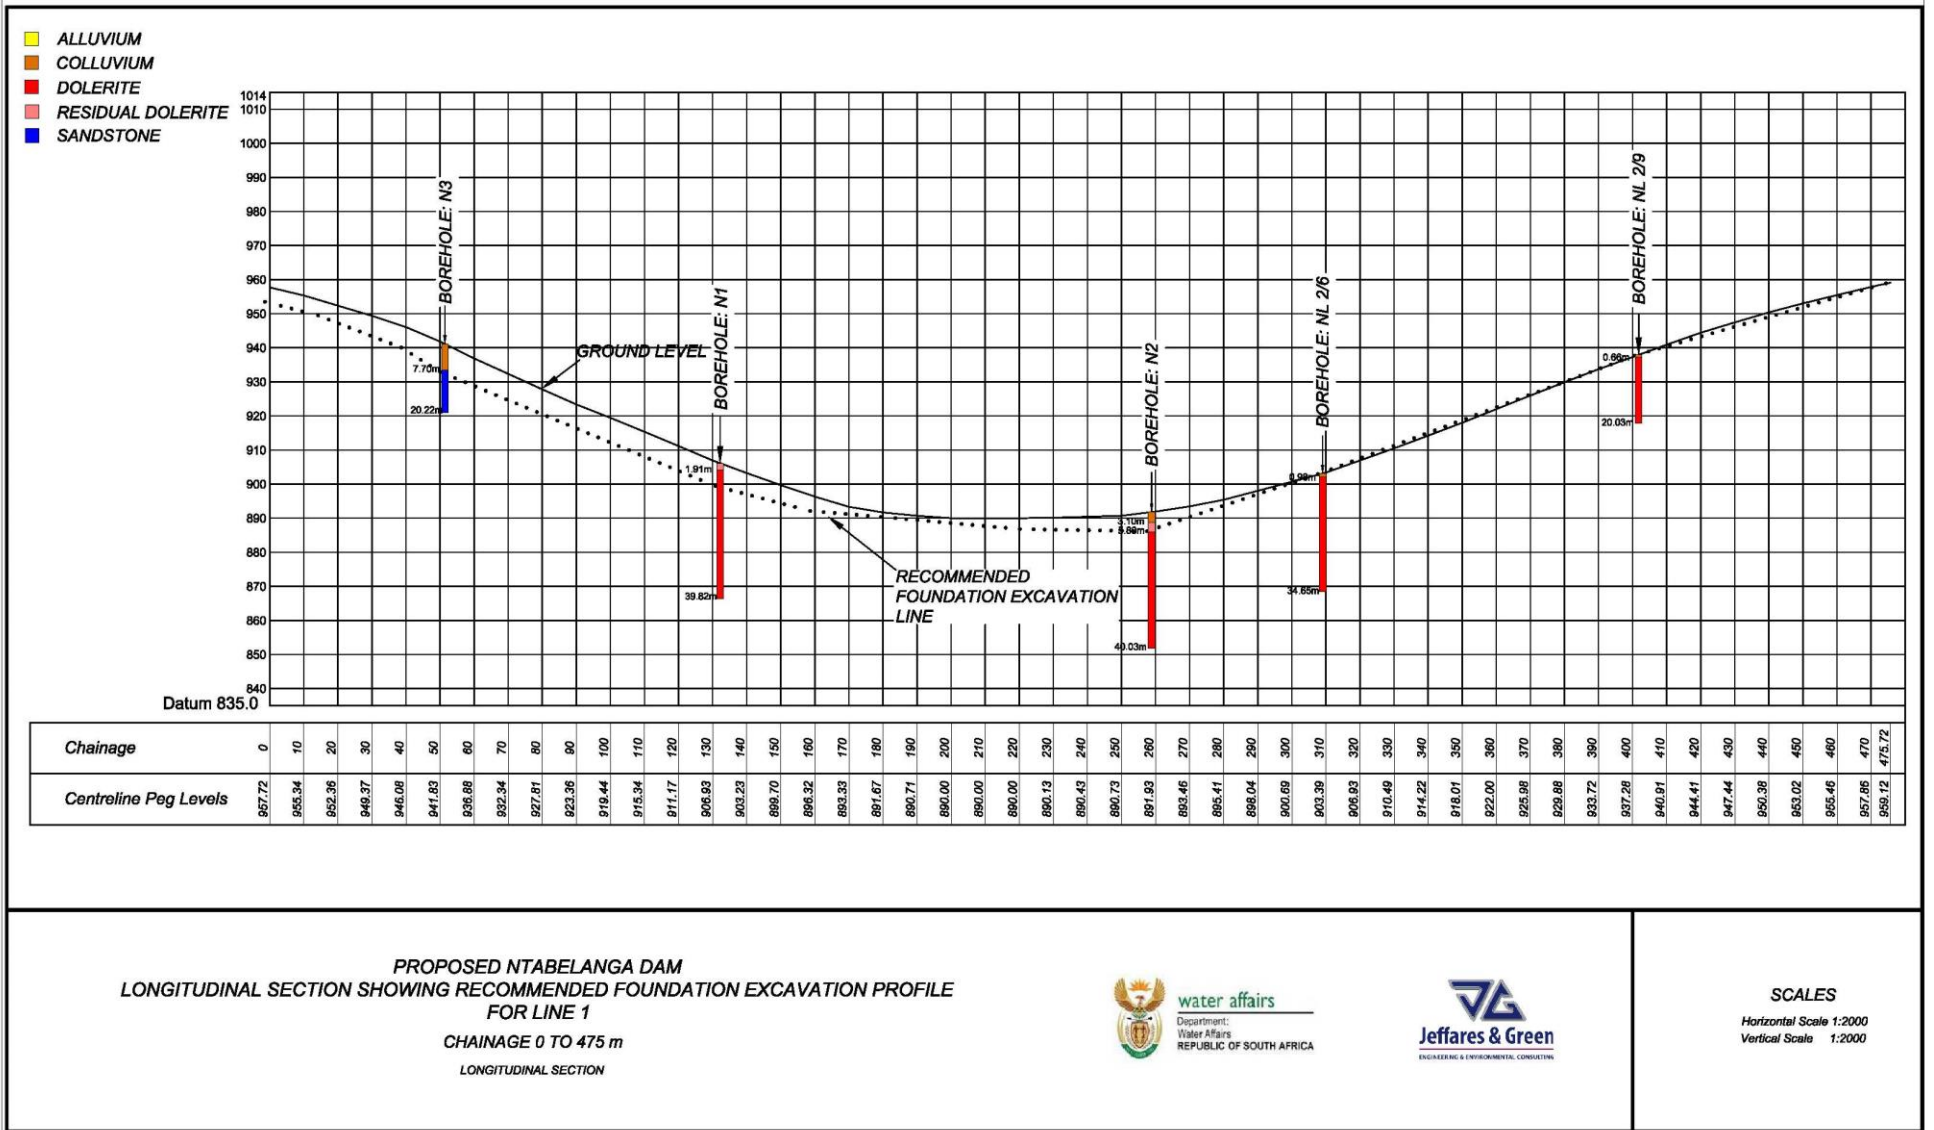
LS - Recommended Foundation Excavation Profile for Line 1
